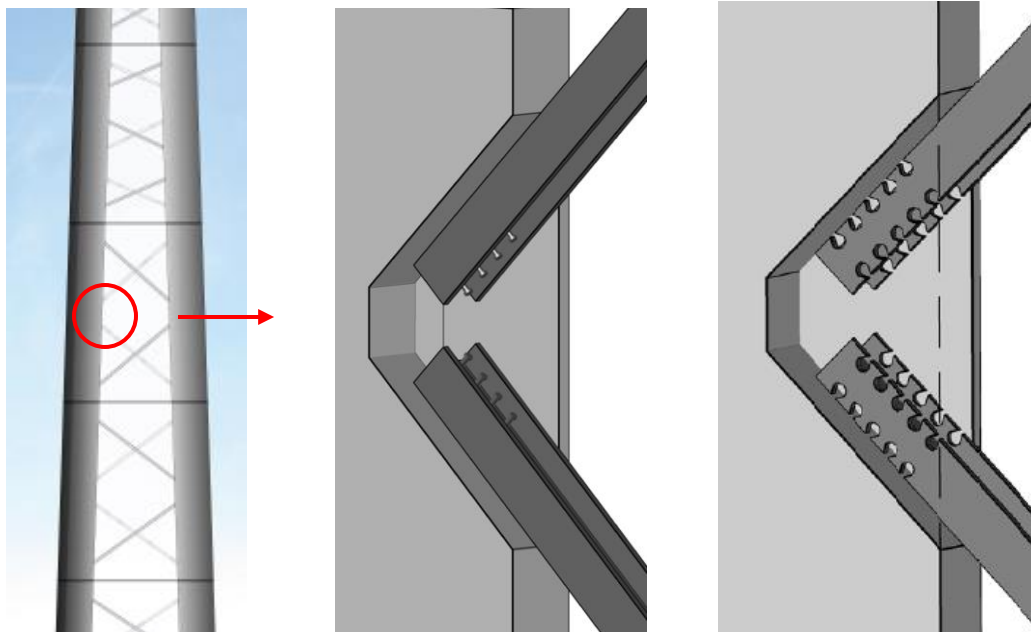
Connection of trussed beams with head bolts (left) and concrete dowels (right)
